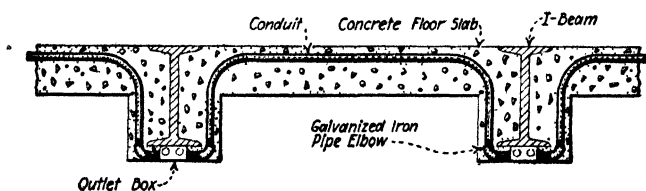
Pipe elbows used under an I-beam where space is restricted.
